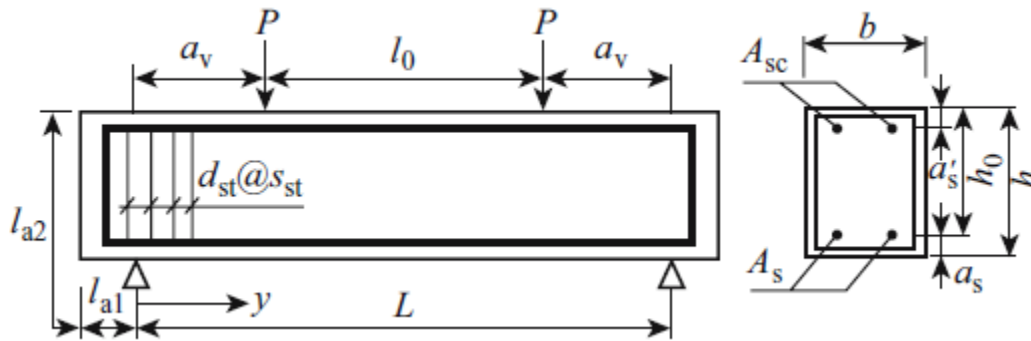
A schematic drawing for RC beam (Wang & Liu, 2008)
